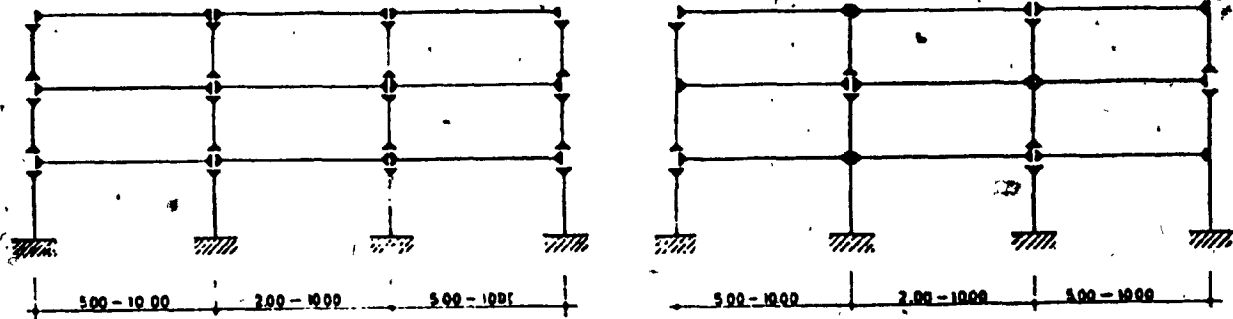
Multistorey Building - Frame System Spliced Columns (21)
